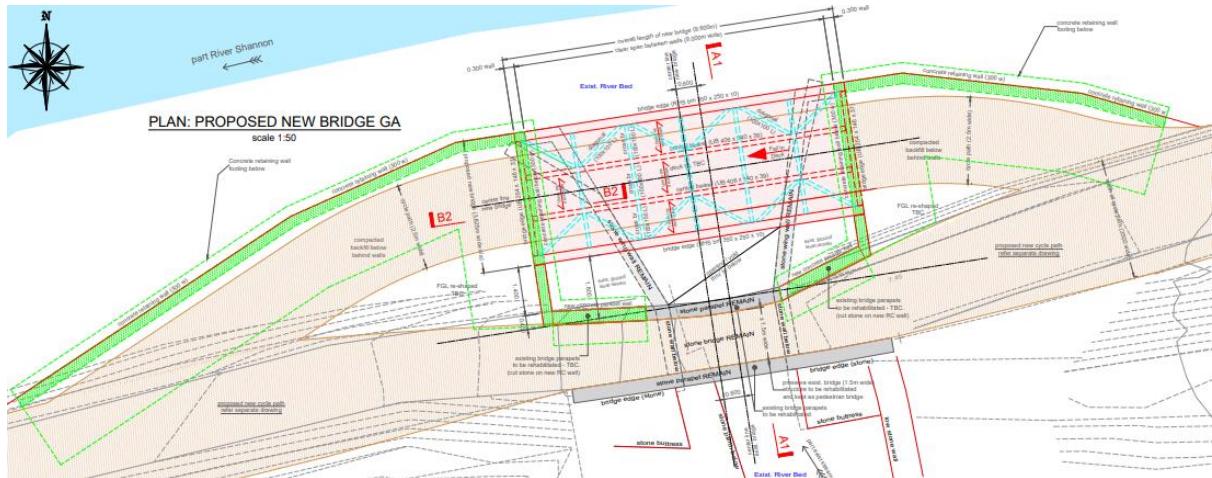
Plan for the proposed new bridge 2 alongside the existing stone bridge (refer to drawing RHA-XX-DR-S-SP0021)
